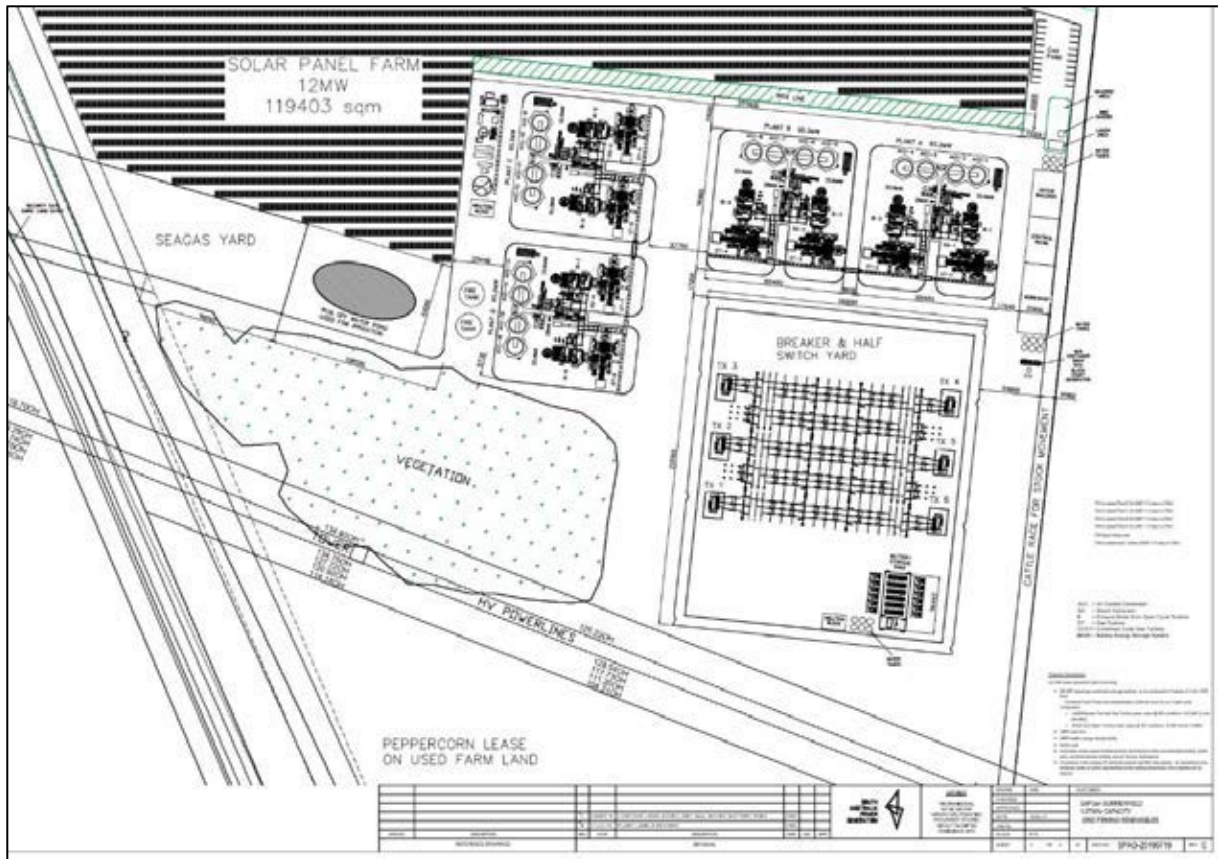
Proposed Summerfield Power Generation Project Plant Layout
